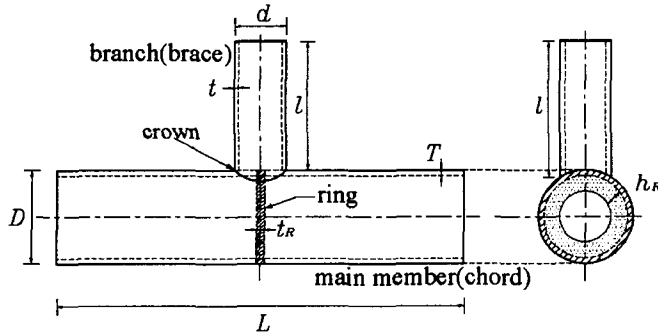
Dimensions of internal ring stiffened tubular T-joints.
